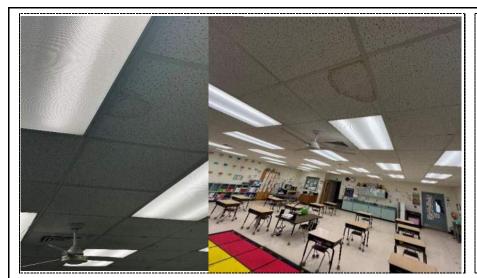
Water stained ceiling tiles throughout North and South classroomsbuilding 2.
